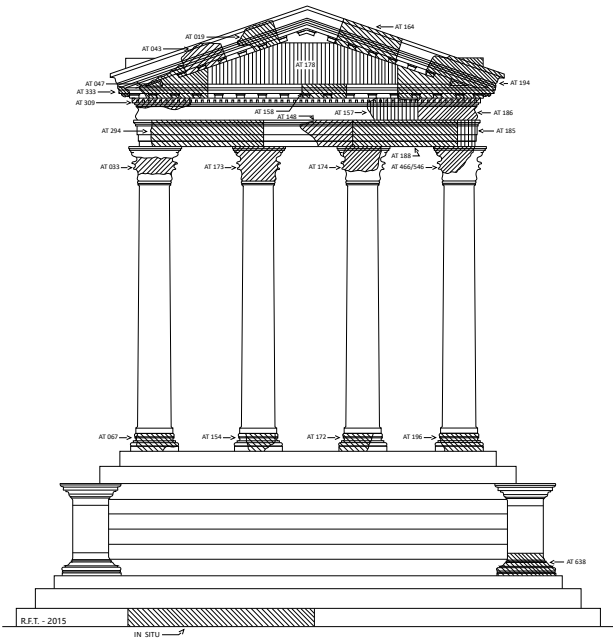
Northeast Temple. Elevation of Southwest Façade (front) (drawing by R. Townsend).
